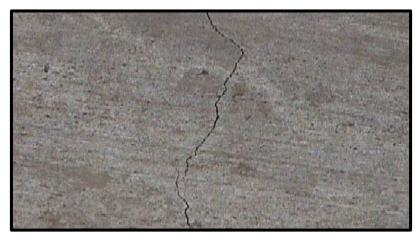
A Crack in a concrete member due to structural overload [5]
